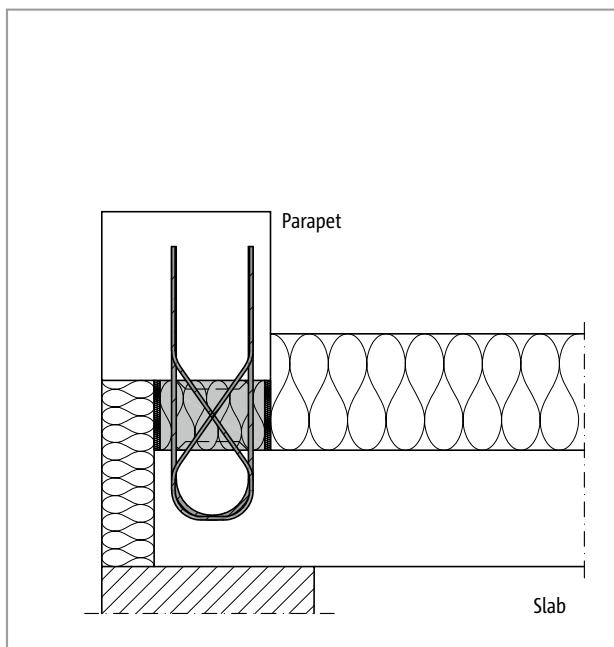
Schöck Isokorb® XT type A: Connection of a parapet (XT type A-MM1)
